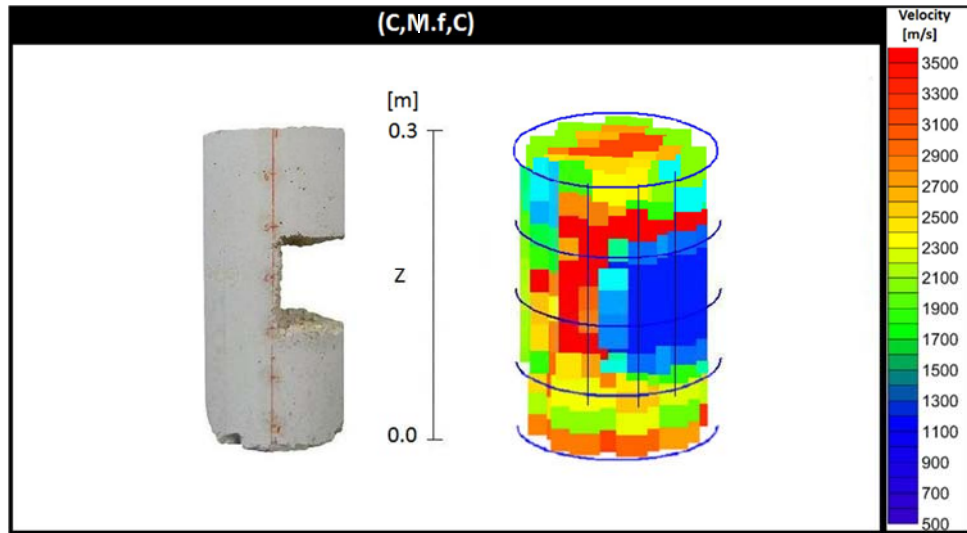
Inspecting of the cylinder (C,M|f,C)(left picture); 3D ultrasonic tomography by Geotom CG (right picture)
